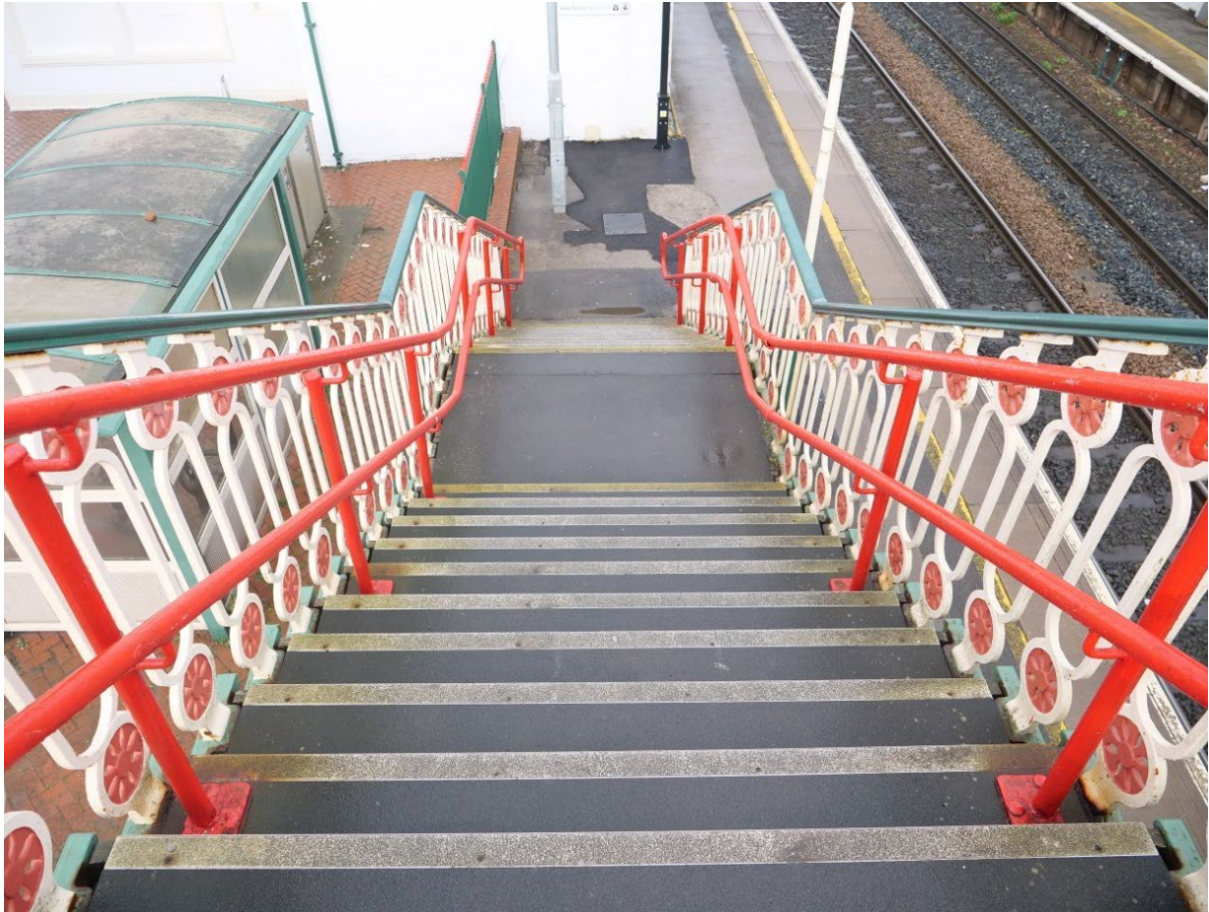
Steps and modern safety handrails on southwest staircase (Platform 2), looking northwest
